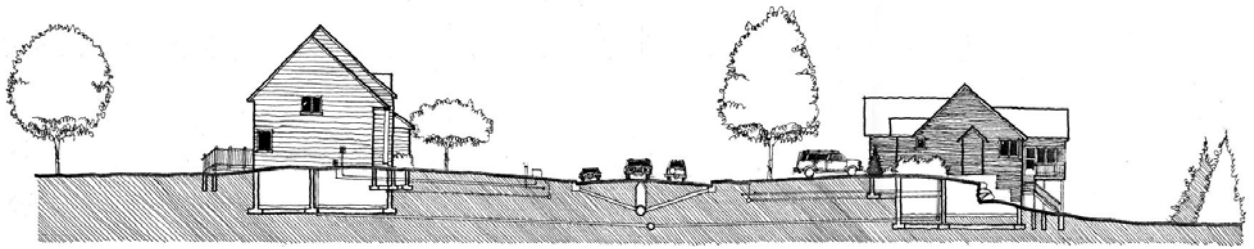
Typical section through a Cottage Grove Neighborhood
